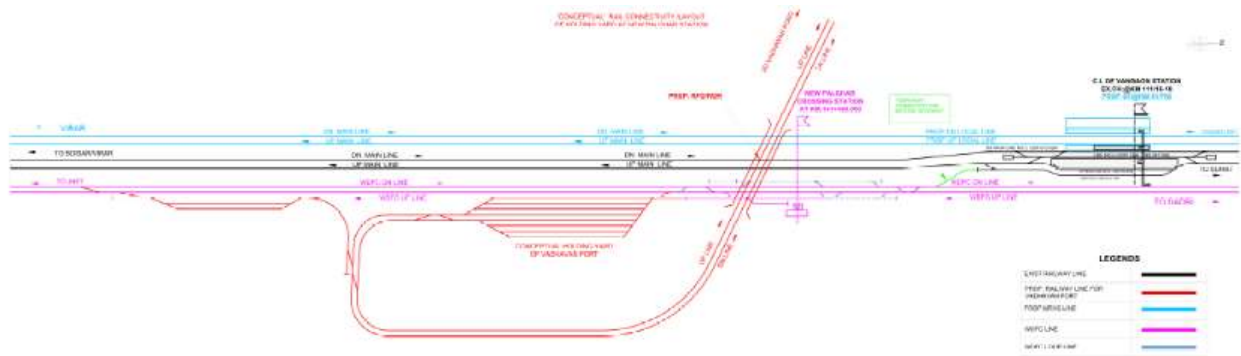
Concept Layout of ROR and New Palghar station arrangement
